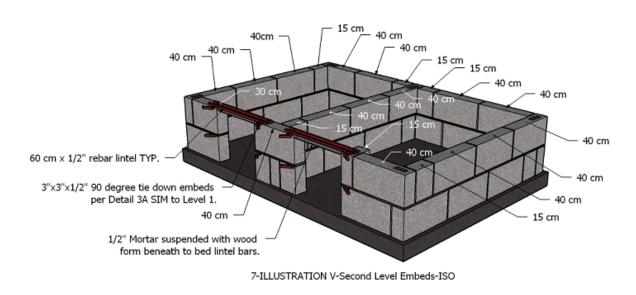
Diagram of base with two layers of concrete block and supportive rebar over back opening.
